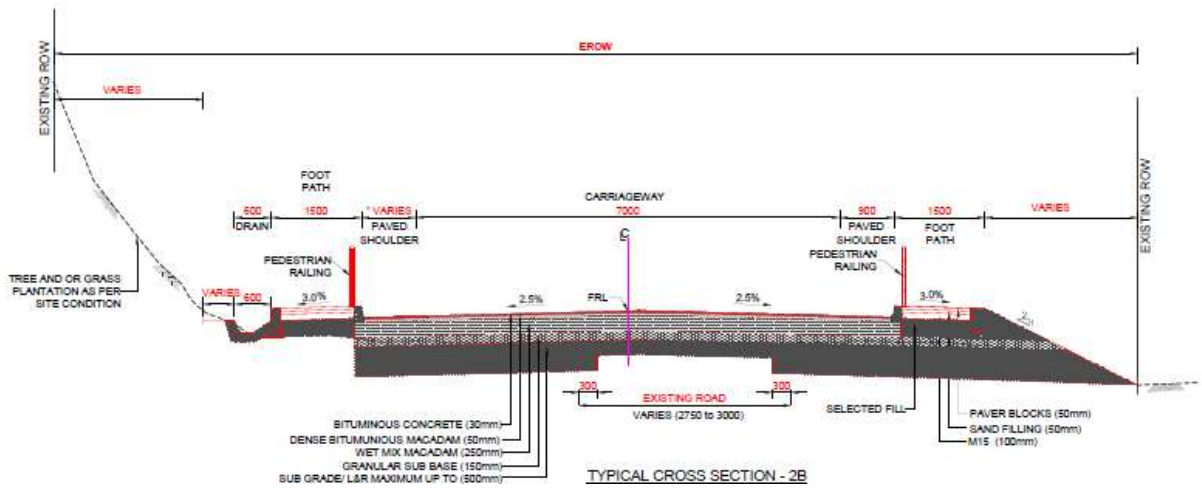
Typical Cross Section with Built-up Section (TCS-2B)
